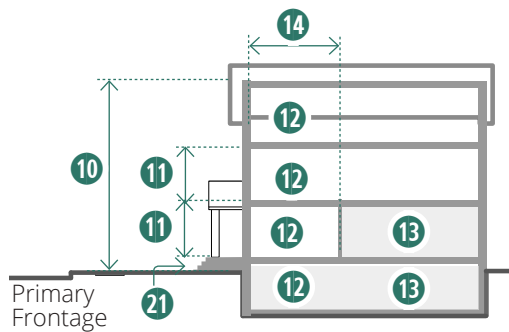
F-2. Row Building: Height & Use Requirements
